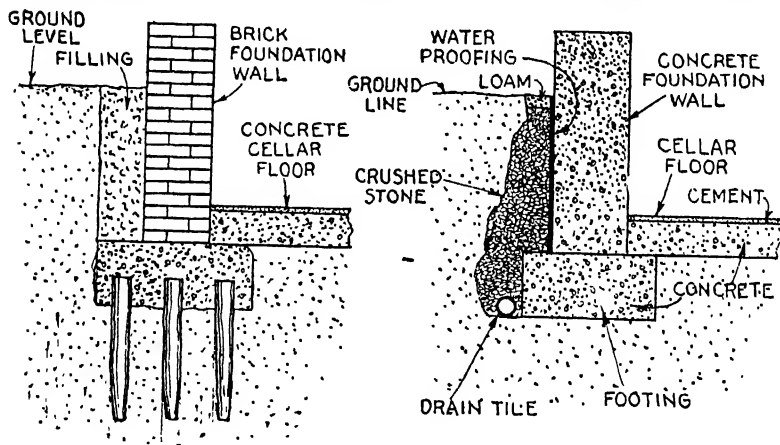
Foundation construction showing footing of piling embedded in concrete cap, and brick foundation wall, the cellar being provided with a concrete floor.
